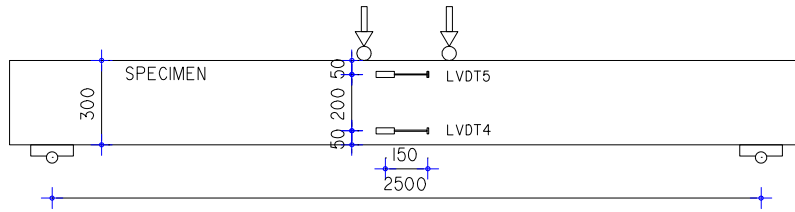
Position of transducers (LVDT) on concrete at midspan section.
